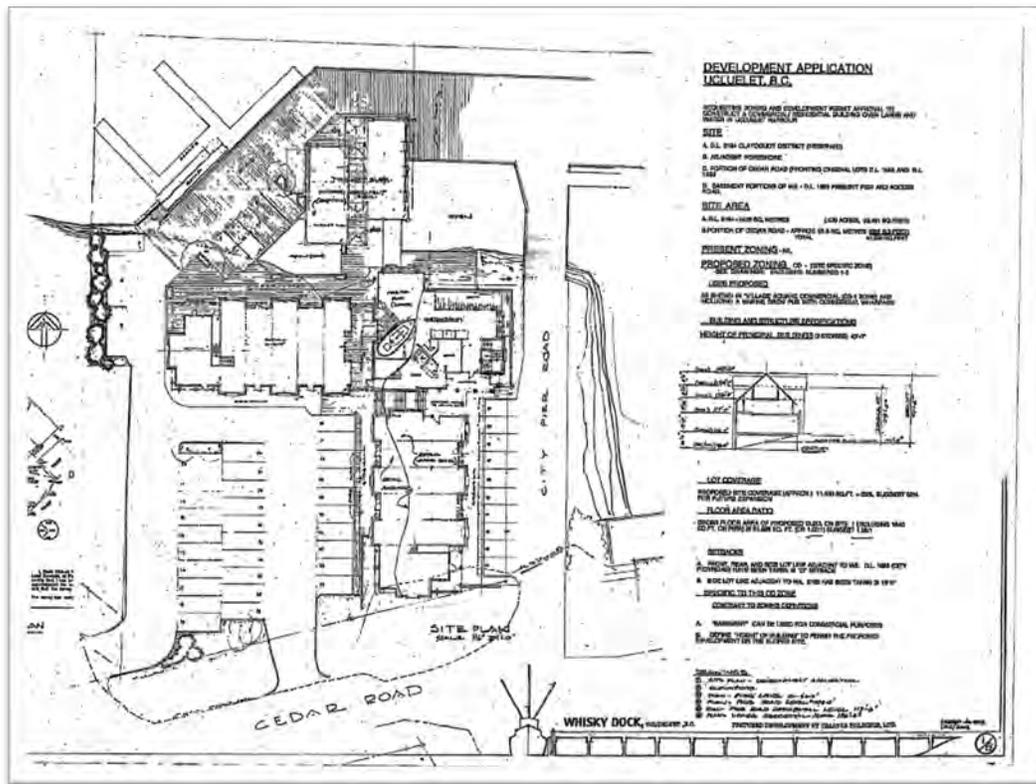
Site plan demonstrating wharf extension that was proposed for Whiskey Landing. Note marina extension with drive lane, parking stalls, and pub built out over the water lease DL 2167.
